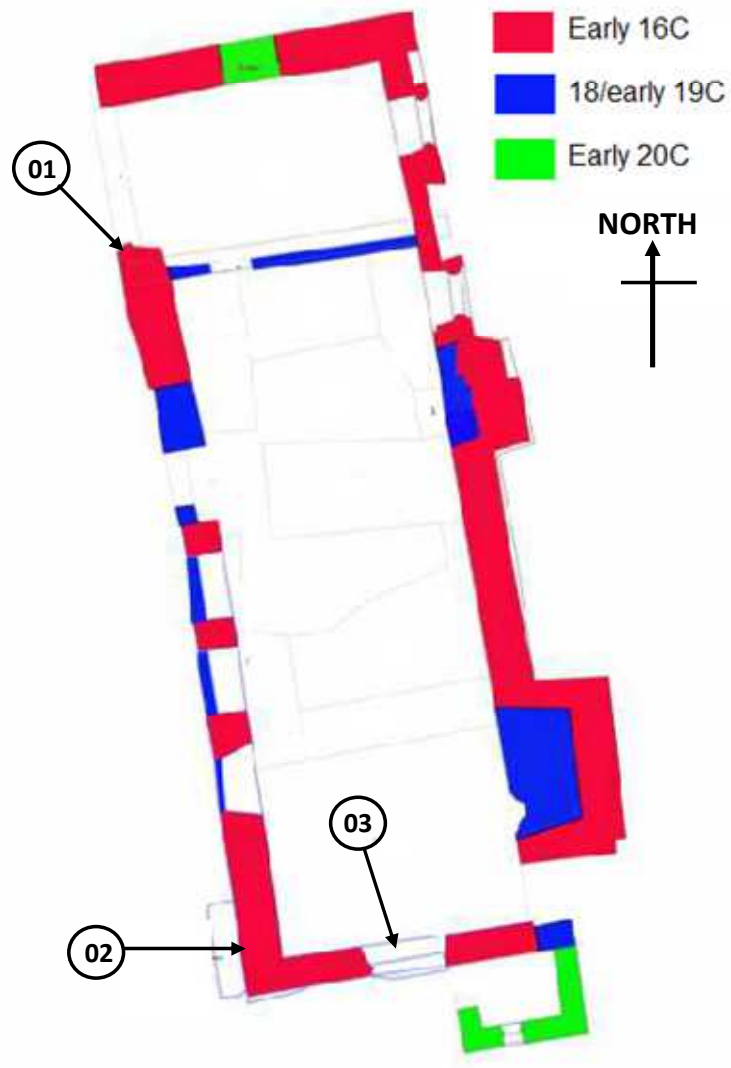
Plan of the East Range at Landmoth Hall to show the phasing of the structure and the approximate positions of the sampled timbers (after Colin Briden)
